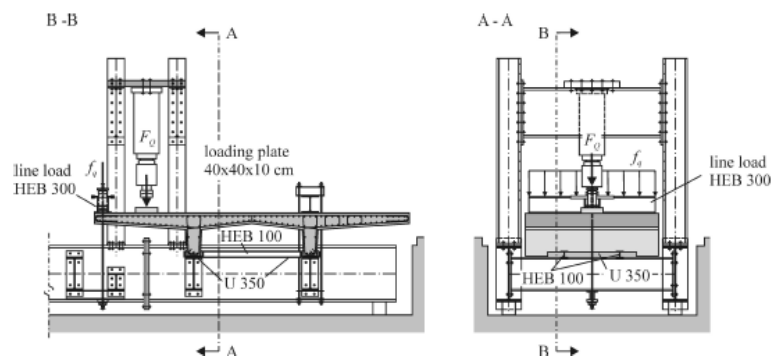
Test setup and load arrangement of the cantilever test for the test specimen VK1 (Rombach and Latte, 2008).
